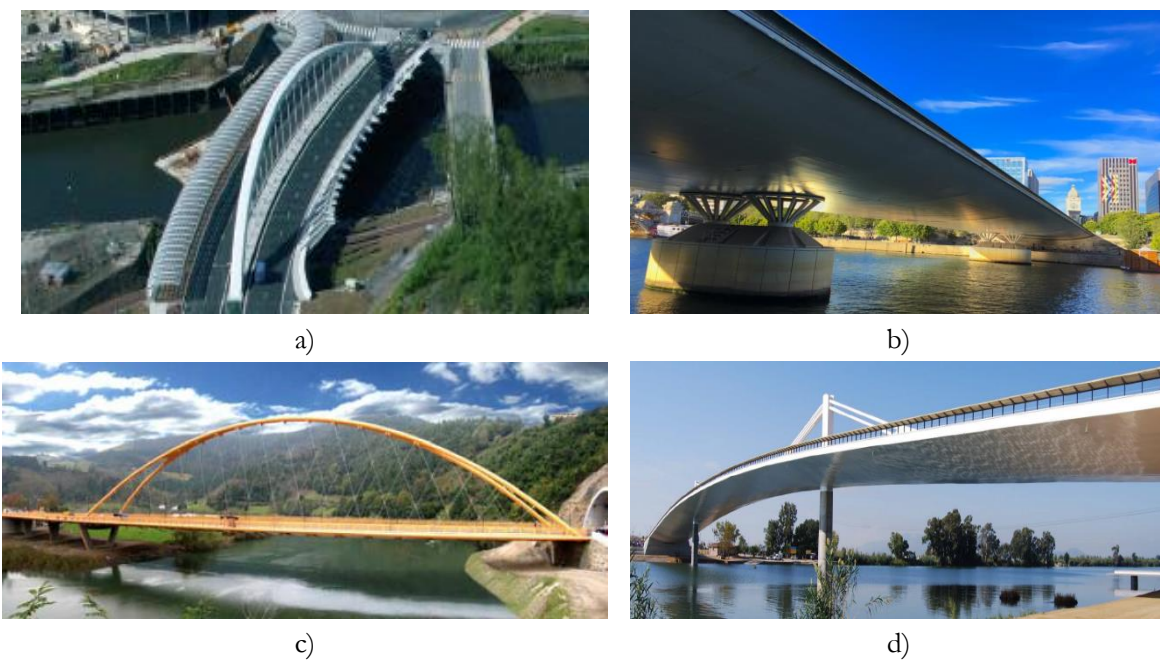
Various bridge types: a) Arch bridge - “Galindo” River Bridge; b) Single girder - Charles de Gaulle Bridge; c) Bow-String arch - River Deba Bridge; and d) Suspension bridge - “Lo Passador” Bridge (see reference in [Table 2.1](#))
